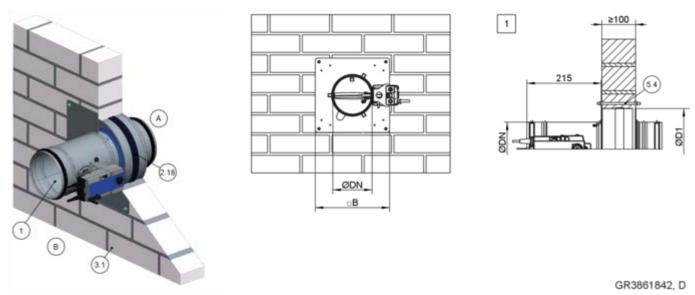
Dry mortarless installation in solid wall with installation block ER
